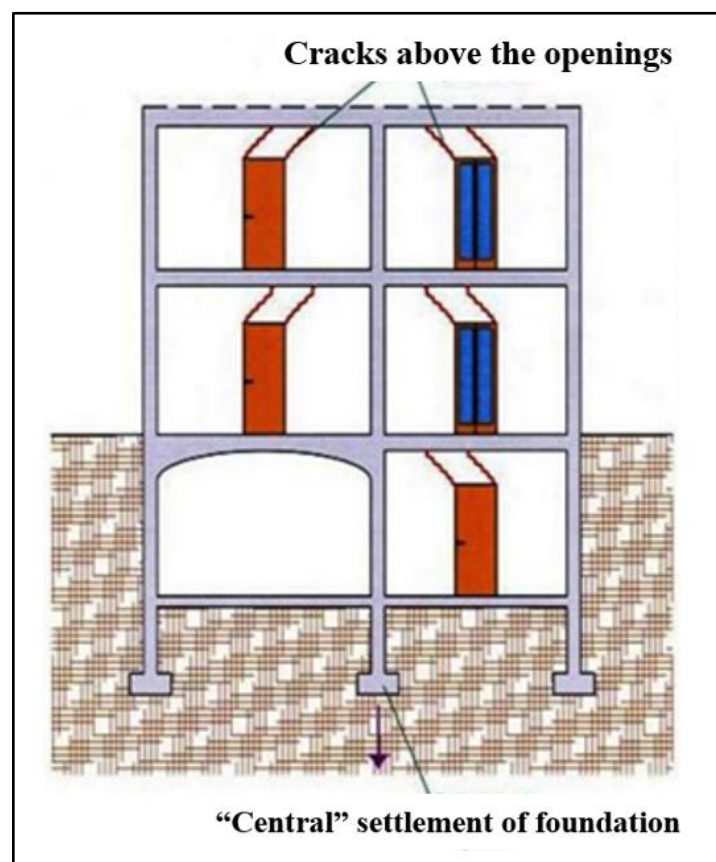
Cracks induced above the openings by a central settlement of foundation (Menditto, 2010).
